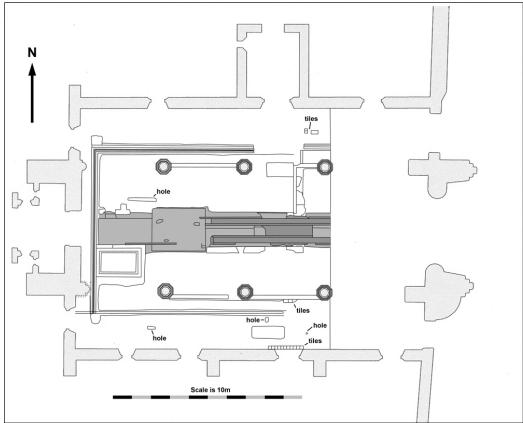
Plan showing the surviving tiles and holes associated with earlier floors.
